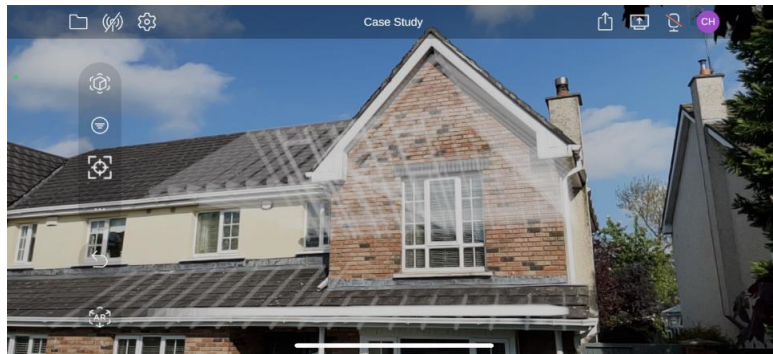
Location of hidden structural framing (joists, rafters) from external view
